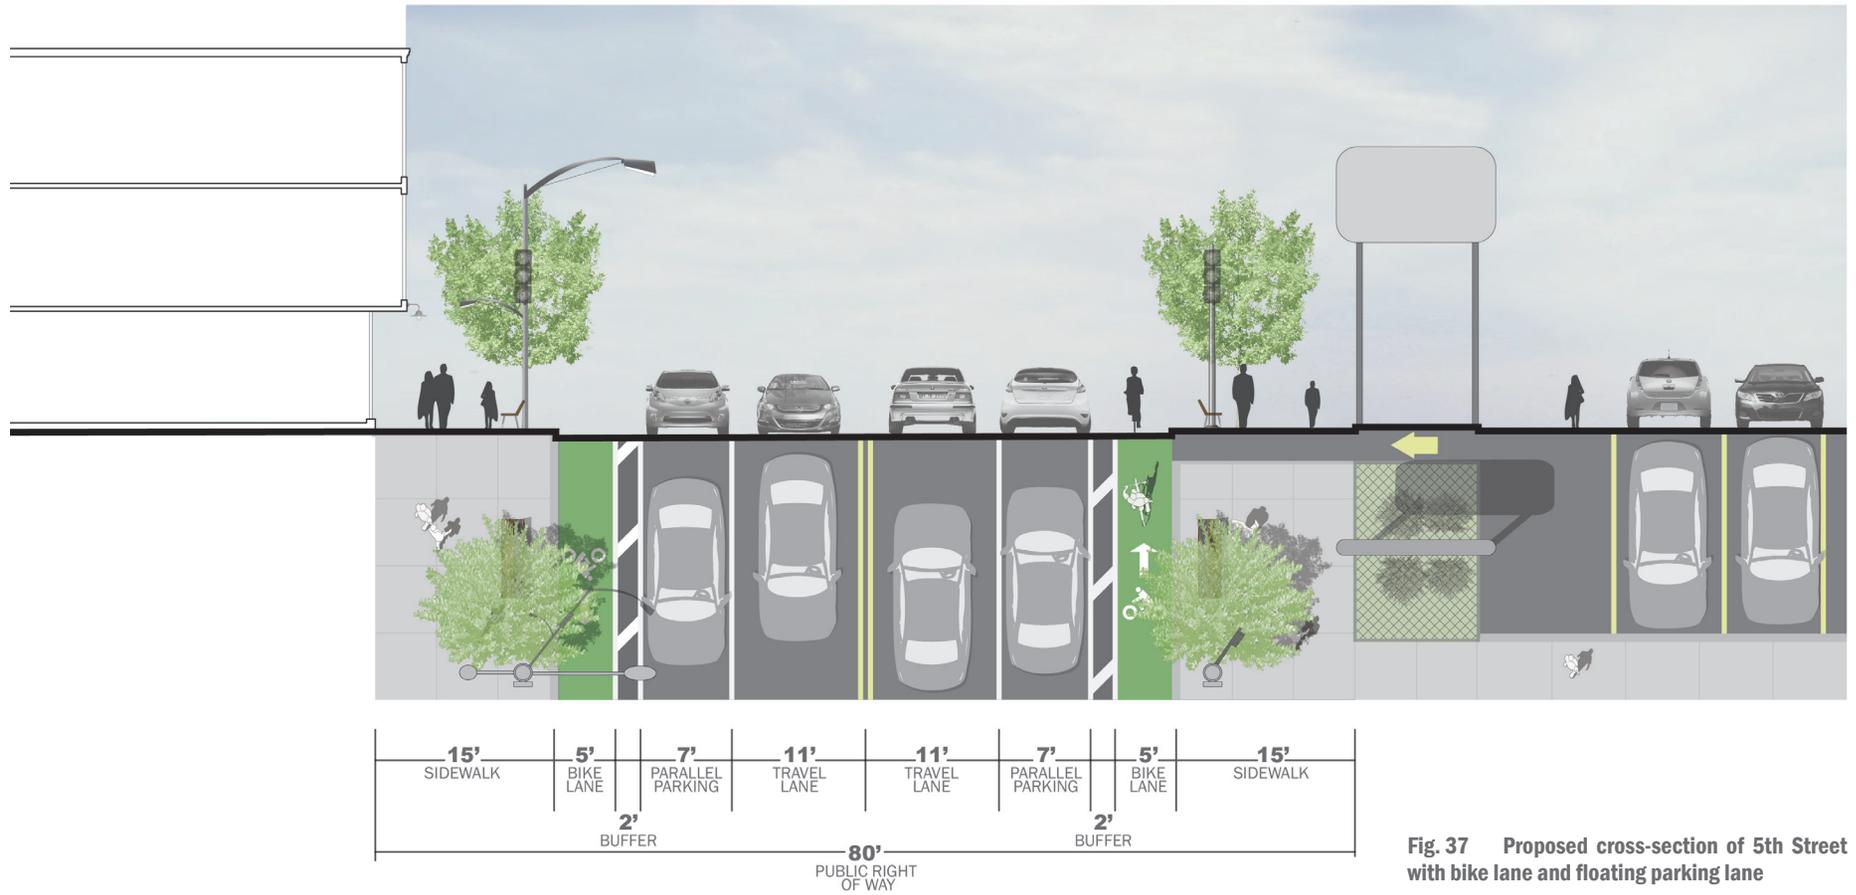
Proposed cross-section of 5th Street with bike lane and floating parking lane
